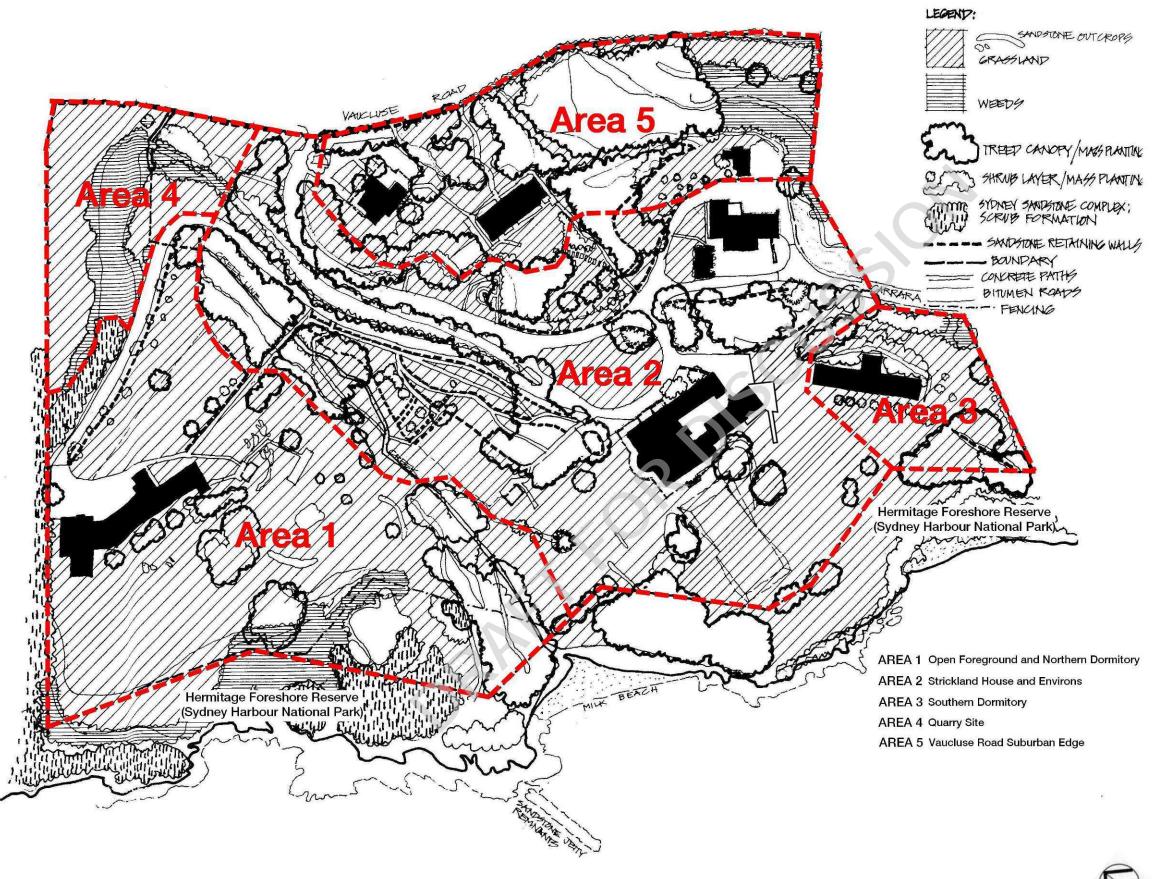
Strickland House site plan illustrating the areas relating to the detailed conservation guidelines, not to scale.
